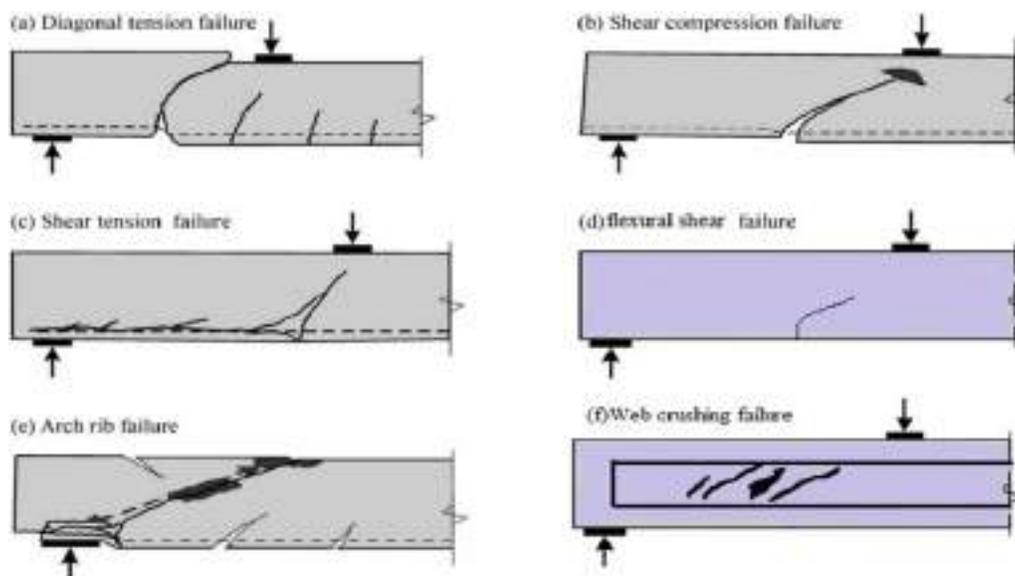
Shear failure modes of concrete beams [9].
